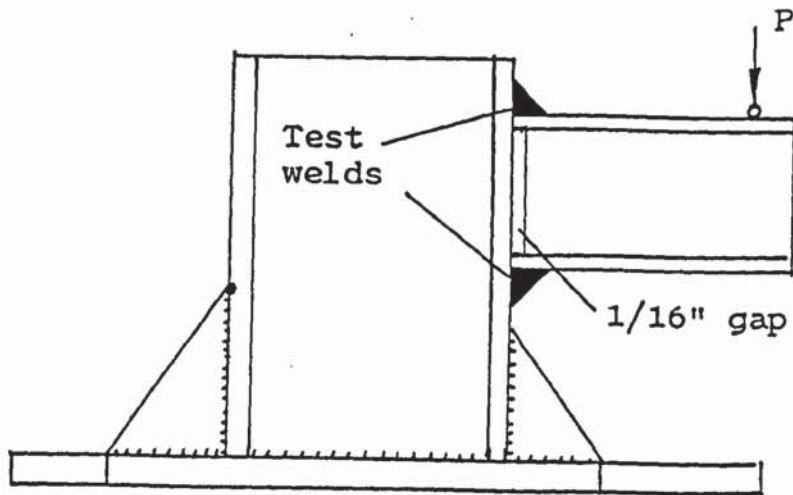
Flange welded connection considered by Commission XV
